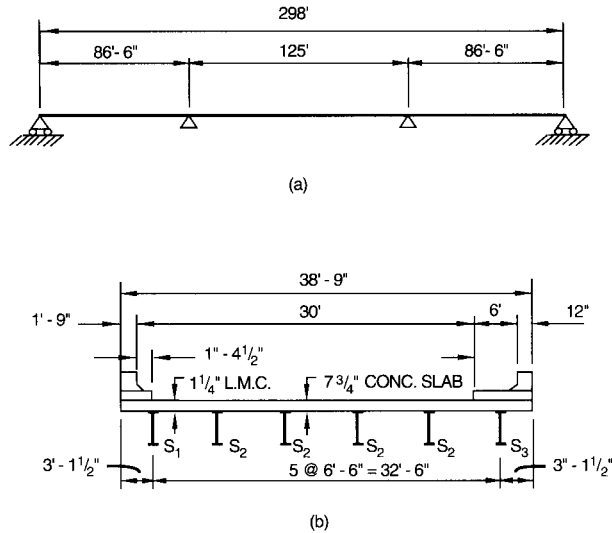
(a) Spans of a continuous highway bridge. (b) Typical cross section of bridge.
